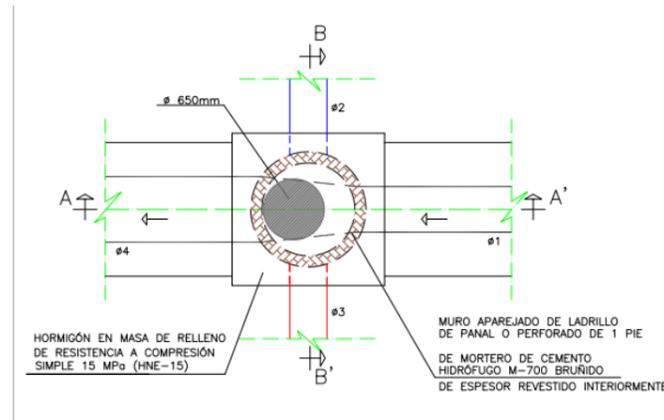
Brickwork manhole type plant. Source: Ayuntamiento de Valencia, 2015
